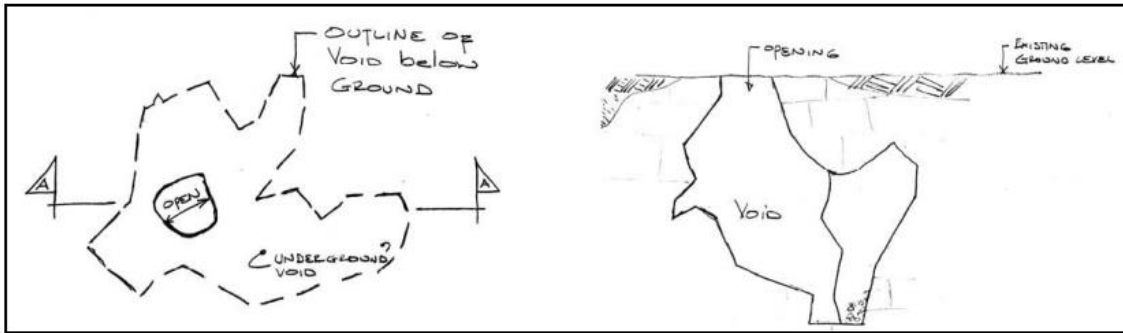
Left: Possible plan of void; Right: Assumed cross-section of void
